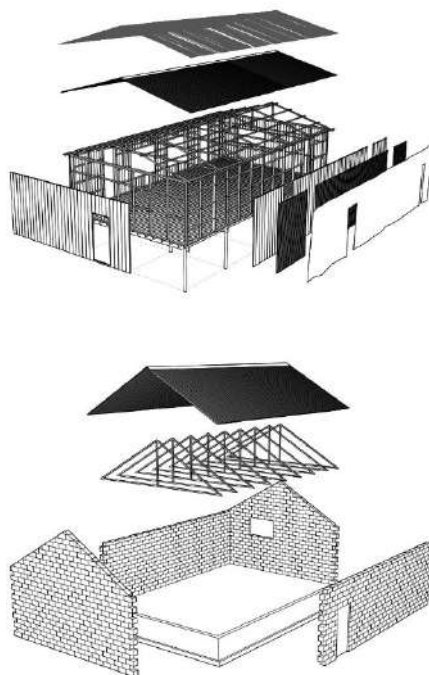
| Typical Brick Construction, commonly found closer to the shore and on the land
